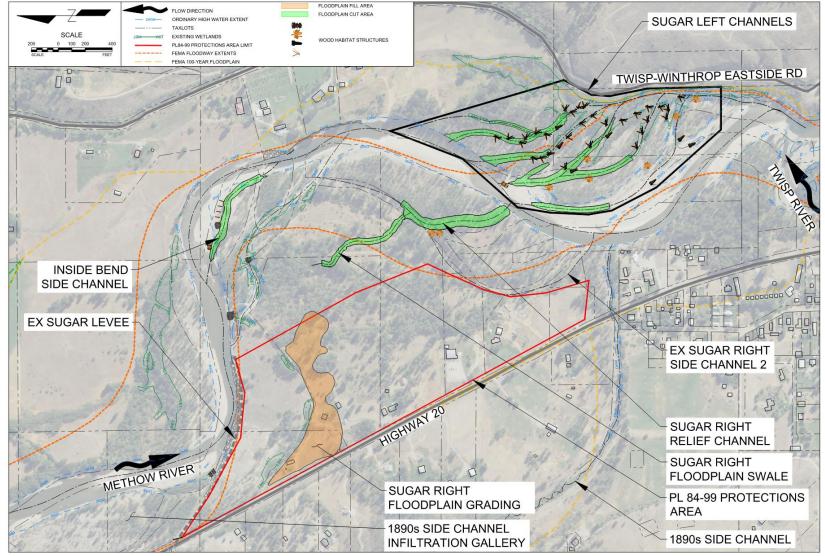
Sugar Channels Reconnection Project Phase 1 proposed overview site plan.
